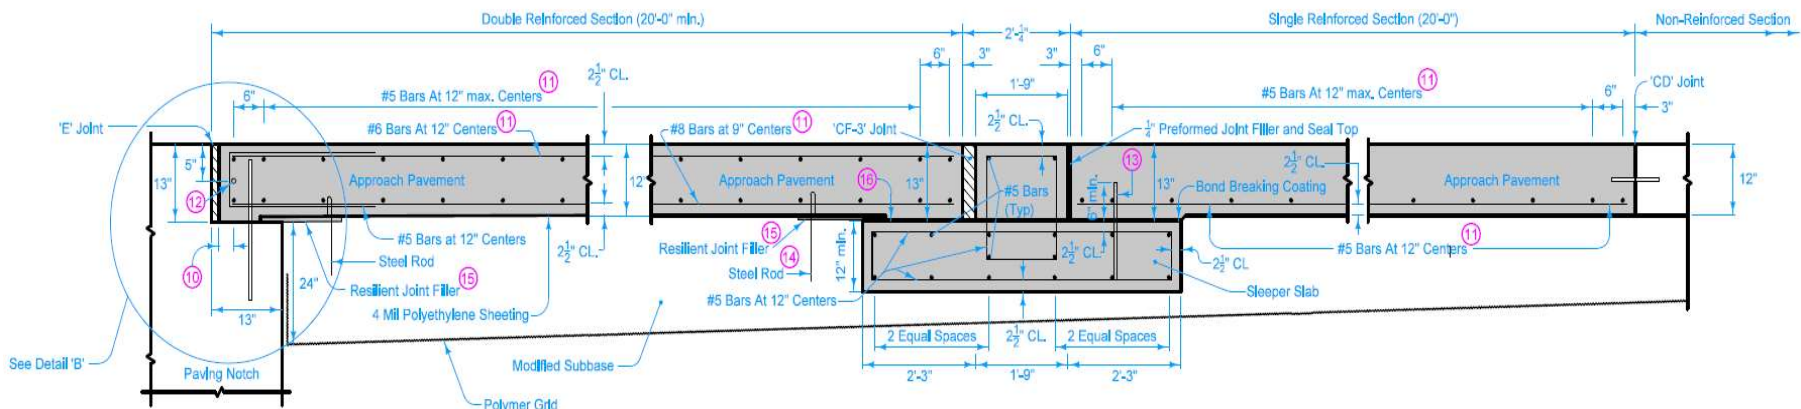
Detail of the sleeper slab as specified by Iowa DOT (Sheet BR-205 of the Standard Road Plans).
